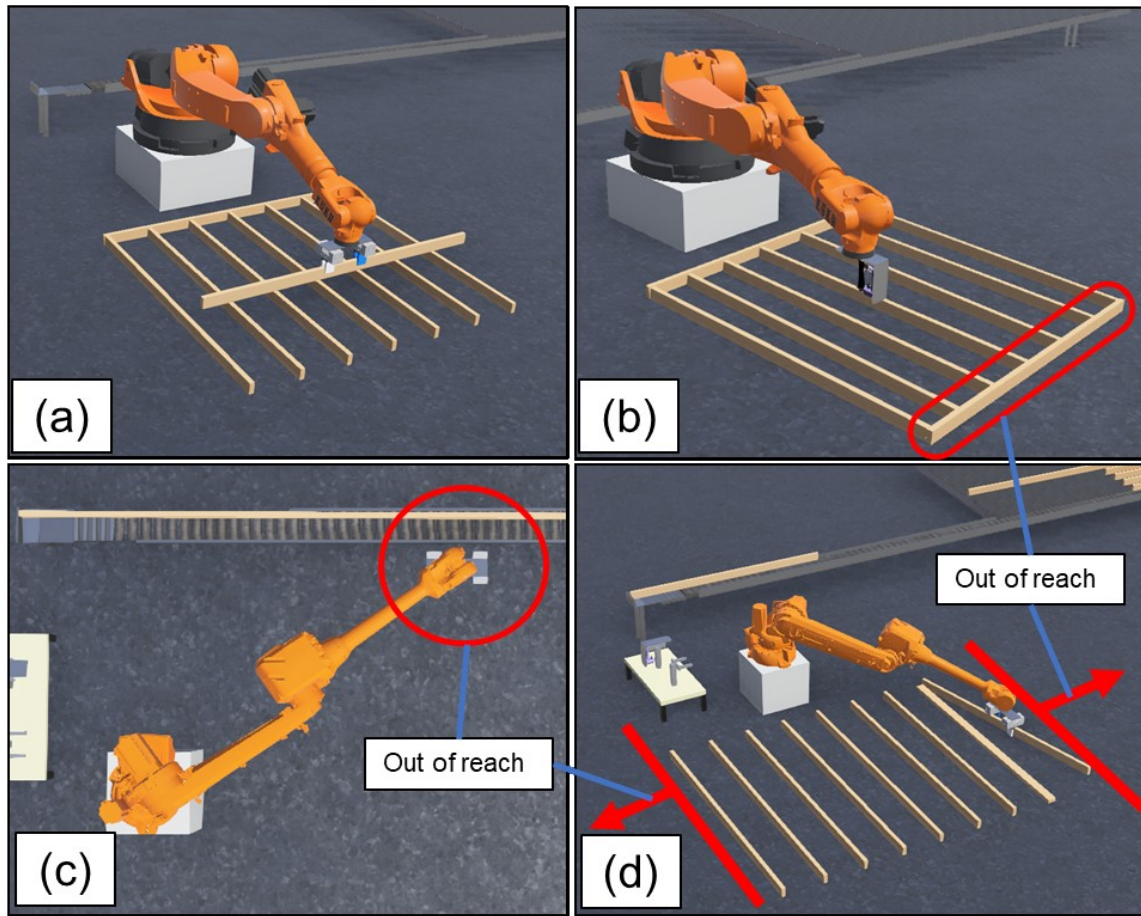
Simulation result for test model 3: a) framing, b) nailing for Wall L and R; c) and d) framing for Wall F and B.
